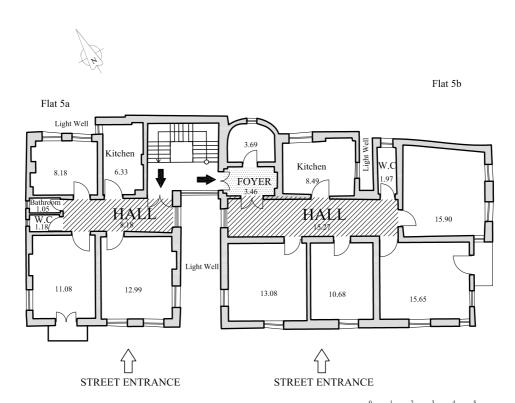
a. Barnathan Apartmanı (Apartment 5), plan
